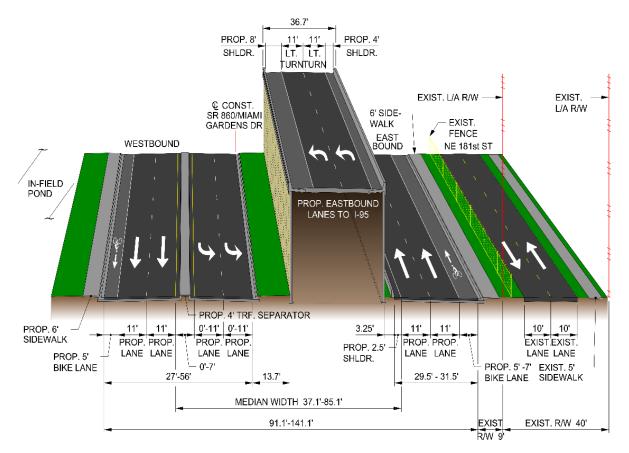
8: Proposed Typical Section - Alternative 2 – SR 860/Miami Gardens
